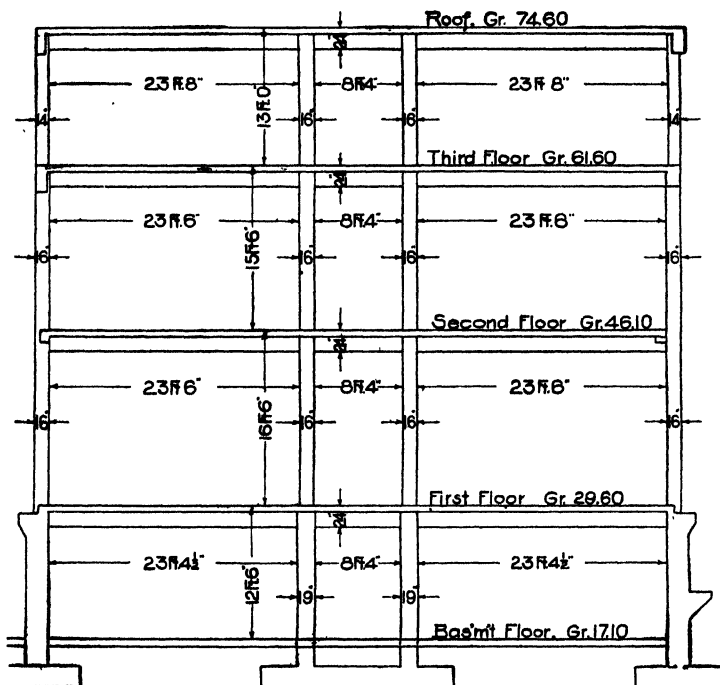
Typical Cross-Section Showing Classrooms Opening on Corridor.
